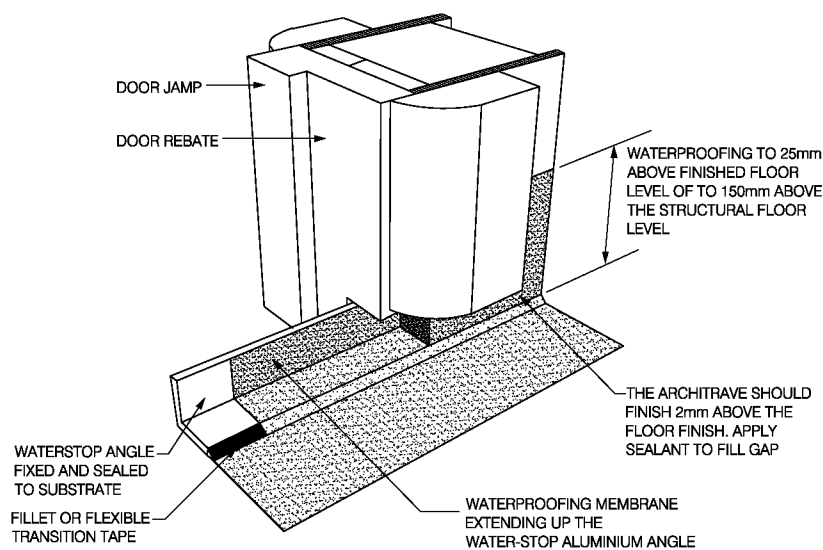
(A) EXAMPLE OF LIQUID WATERPROOFING
